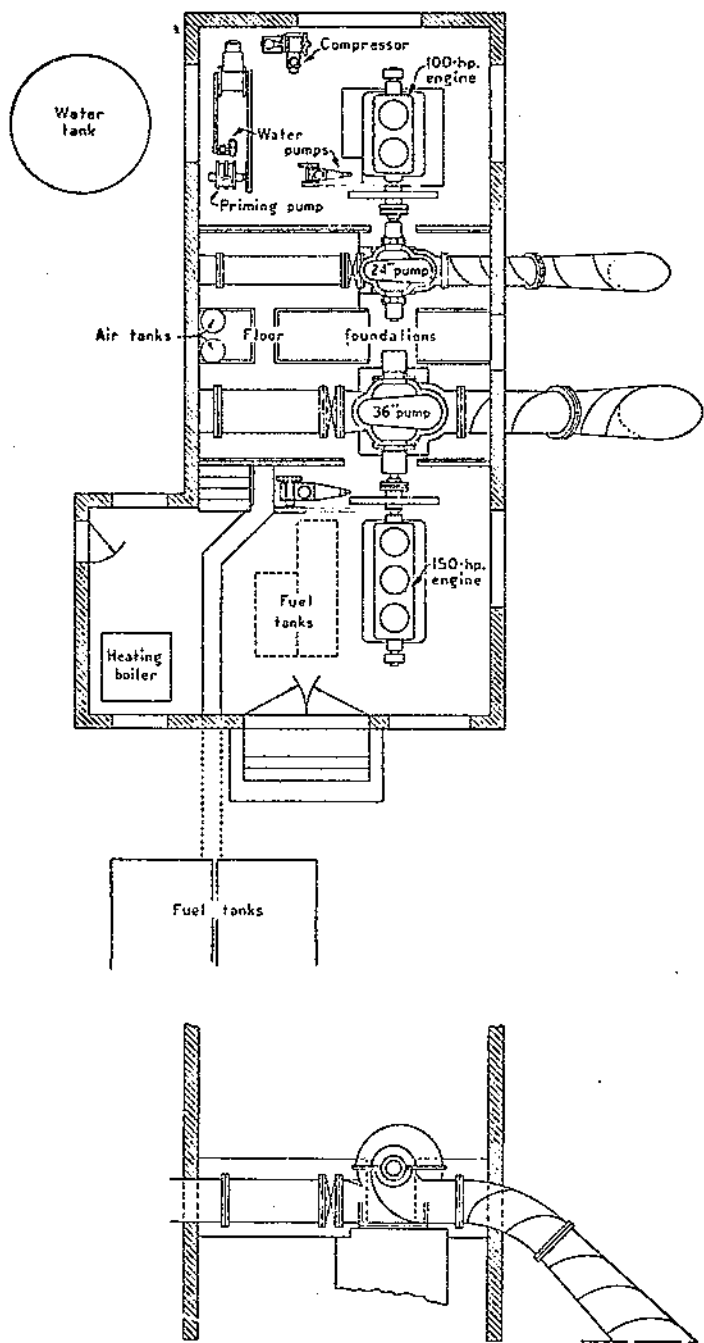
Plan of Valley City pumping plant, comprising 2 semidiesel engines direct-connected to centrifugal pumps and accessory equipment.
